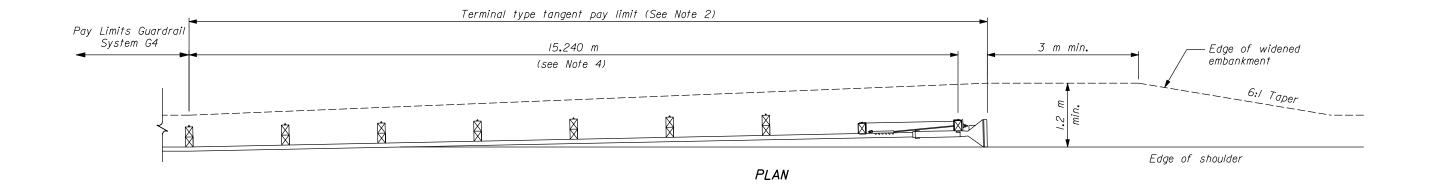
DETAIL APPROVED FOR USE 5/2003 DETAIL W617-20
